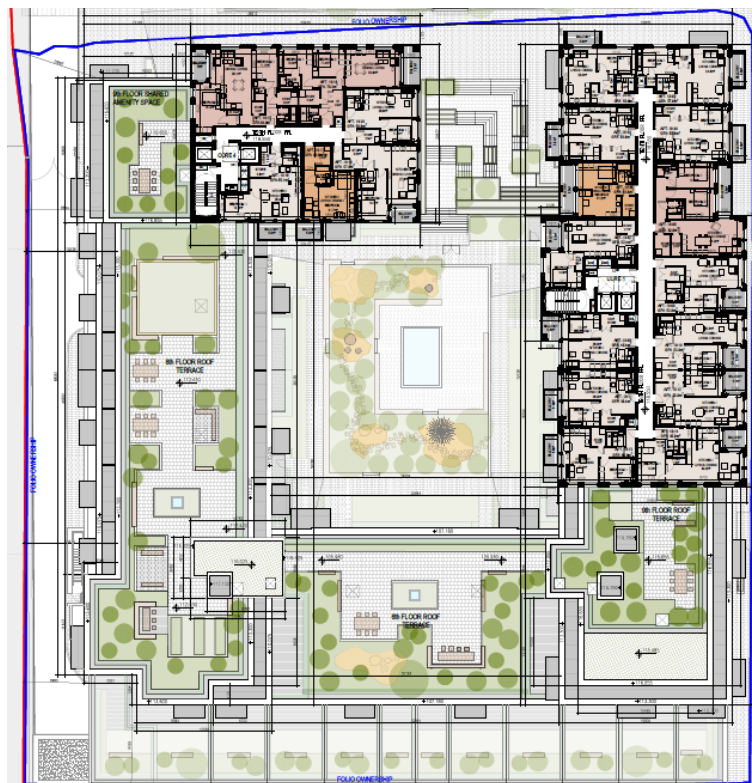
Tenth floor plan. 2 no. studio apartments, 15 no. one-bedroom apartments and 3 no. two-bedroom apartments are provided at this level.
